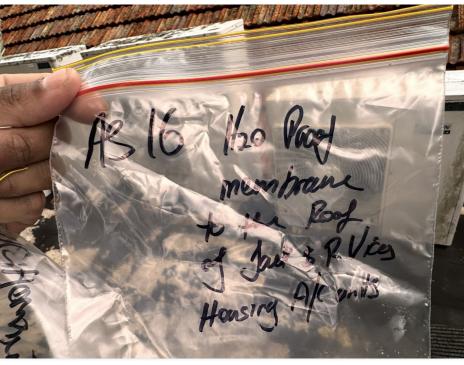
JVB – Sample 16 (S16): Sample of waterproof membrane on roof containing AC units
